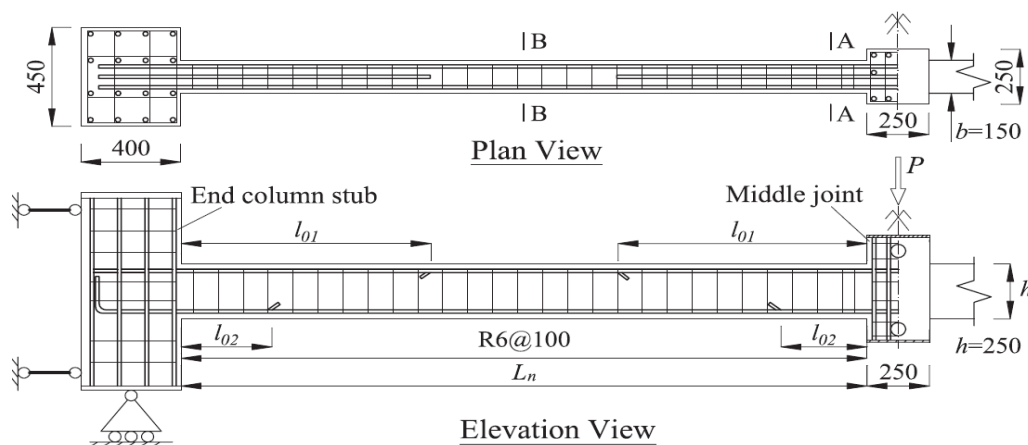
Dimension and Detailing specimens (unit: mm). (Yu and Tan 2012)
